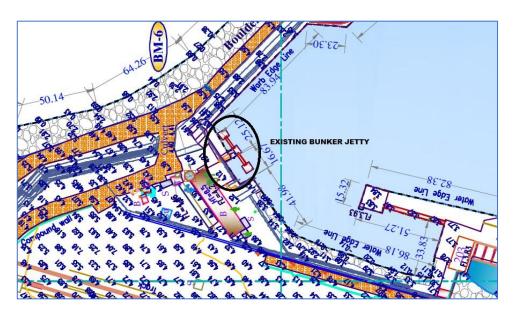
Locaiton and Layout of the Existing Bunker Jetty
